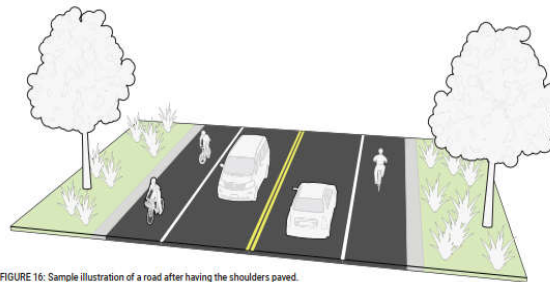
Sample illustration of a road after having the shoulders paved.
